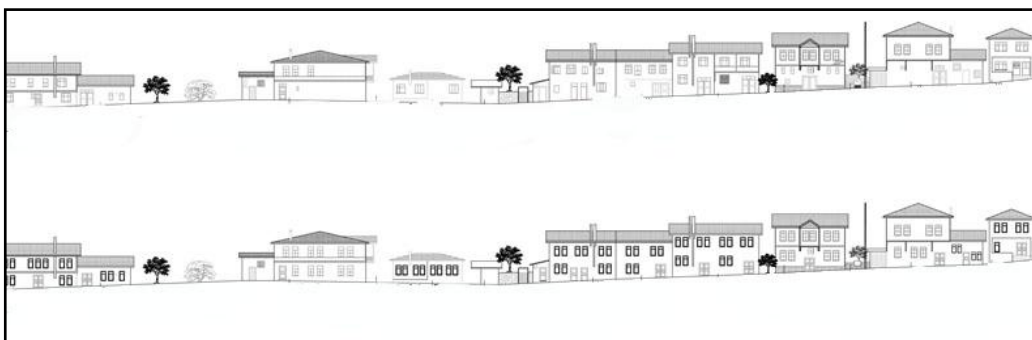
Actual and proposal facades in (B) zone on Mimar Sinan Street.
